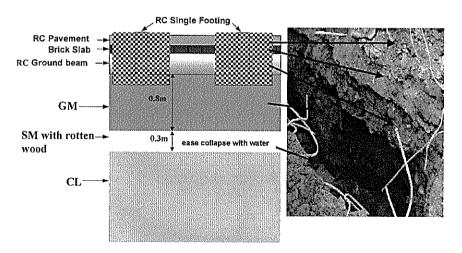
Subsurface Condition Below Building SR-097, Case Two
